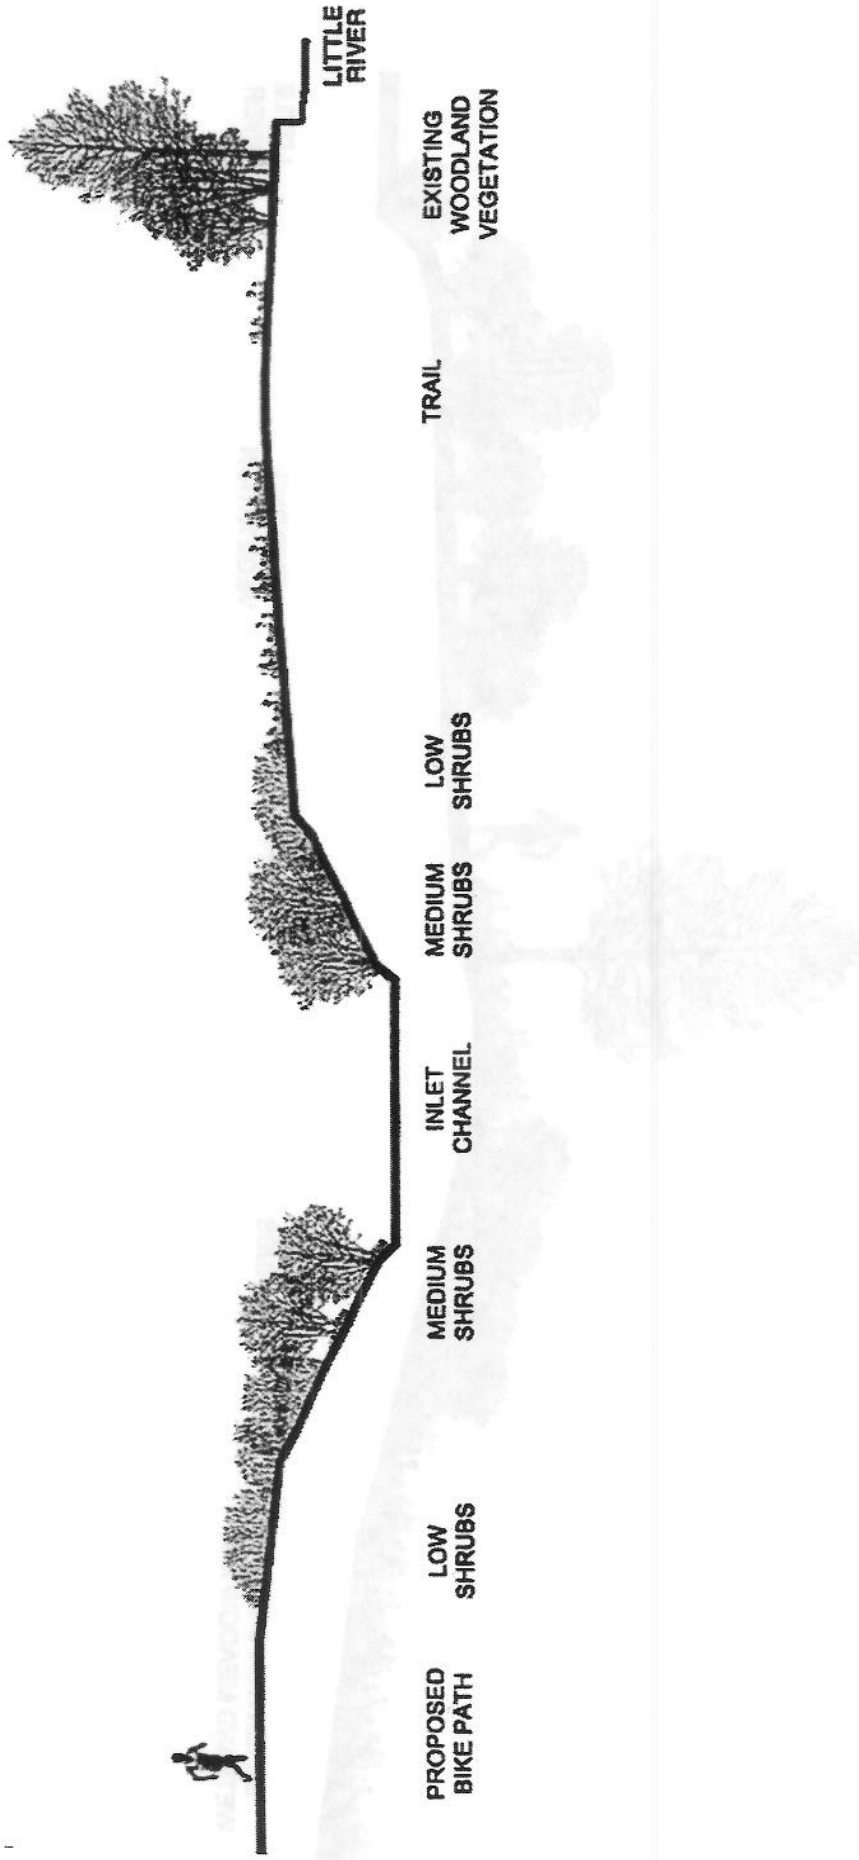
LANDSCAPE SITE PLAN; CROSS SECTION B-B
